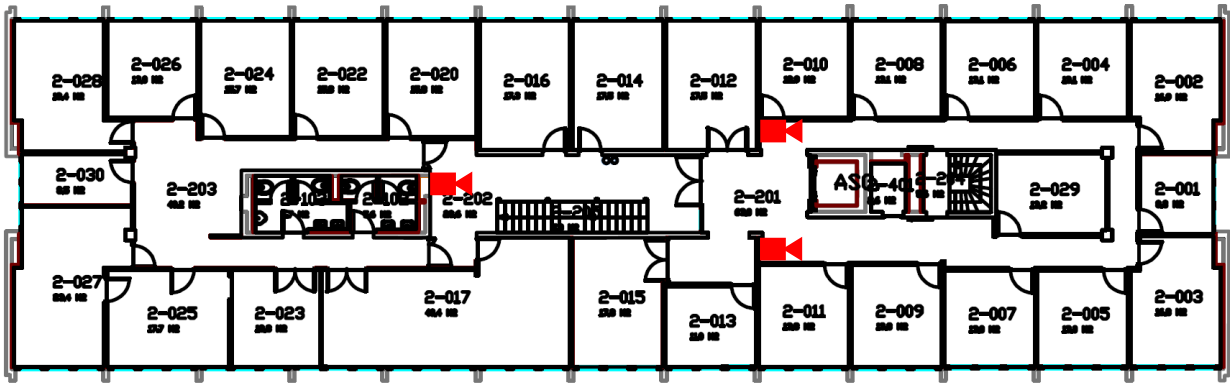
floor R+2 layout as well as the locations and orientations of cameras within this floor
